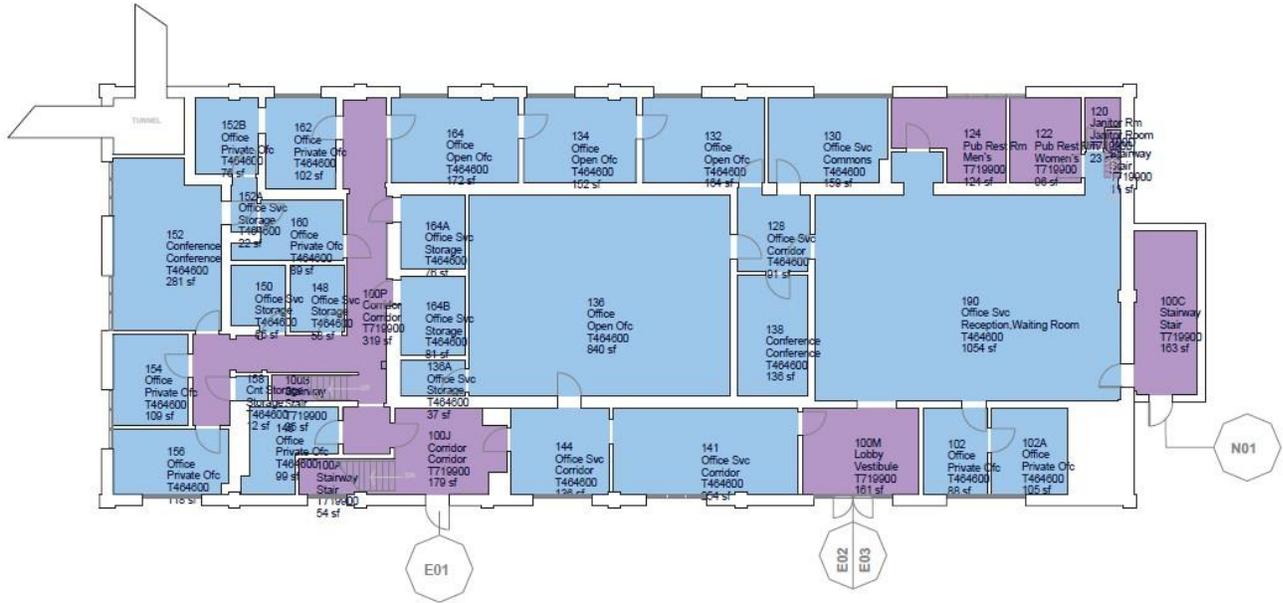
Exhibit II: LPR Space Optimization Study Implementation Plan Diagram – Excerpt and Radio Hall – First Floor Plan of Possible Renovation Test Fit of Program
